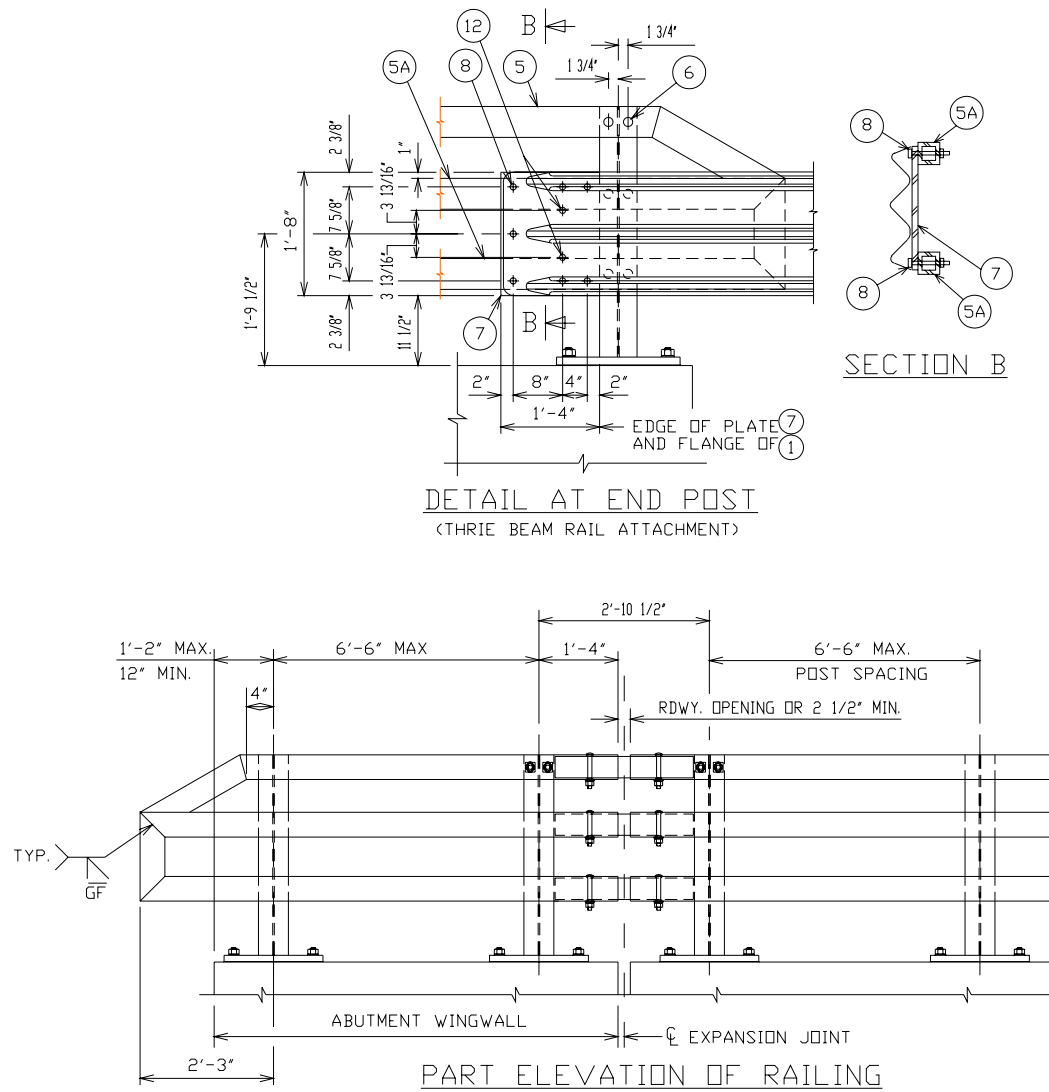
Details of the Type "M" tubular steel bridge rail—anchor details.
